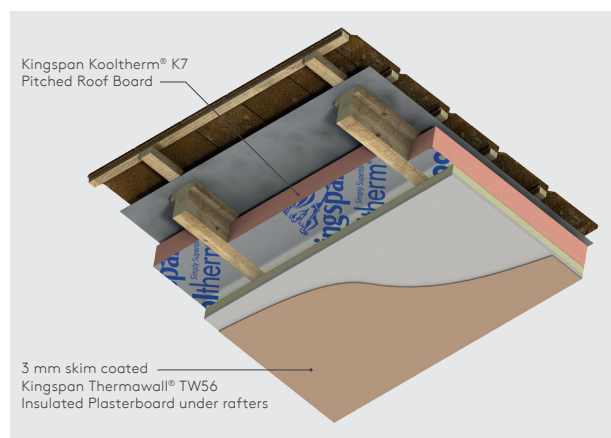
Mechanically fixed to timber rafters with Kingspan Kooltherm® K7 Pitched Roof Board between rafters Thermawall® TW56 Insulated Plasterboard under rafters
